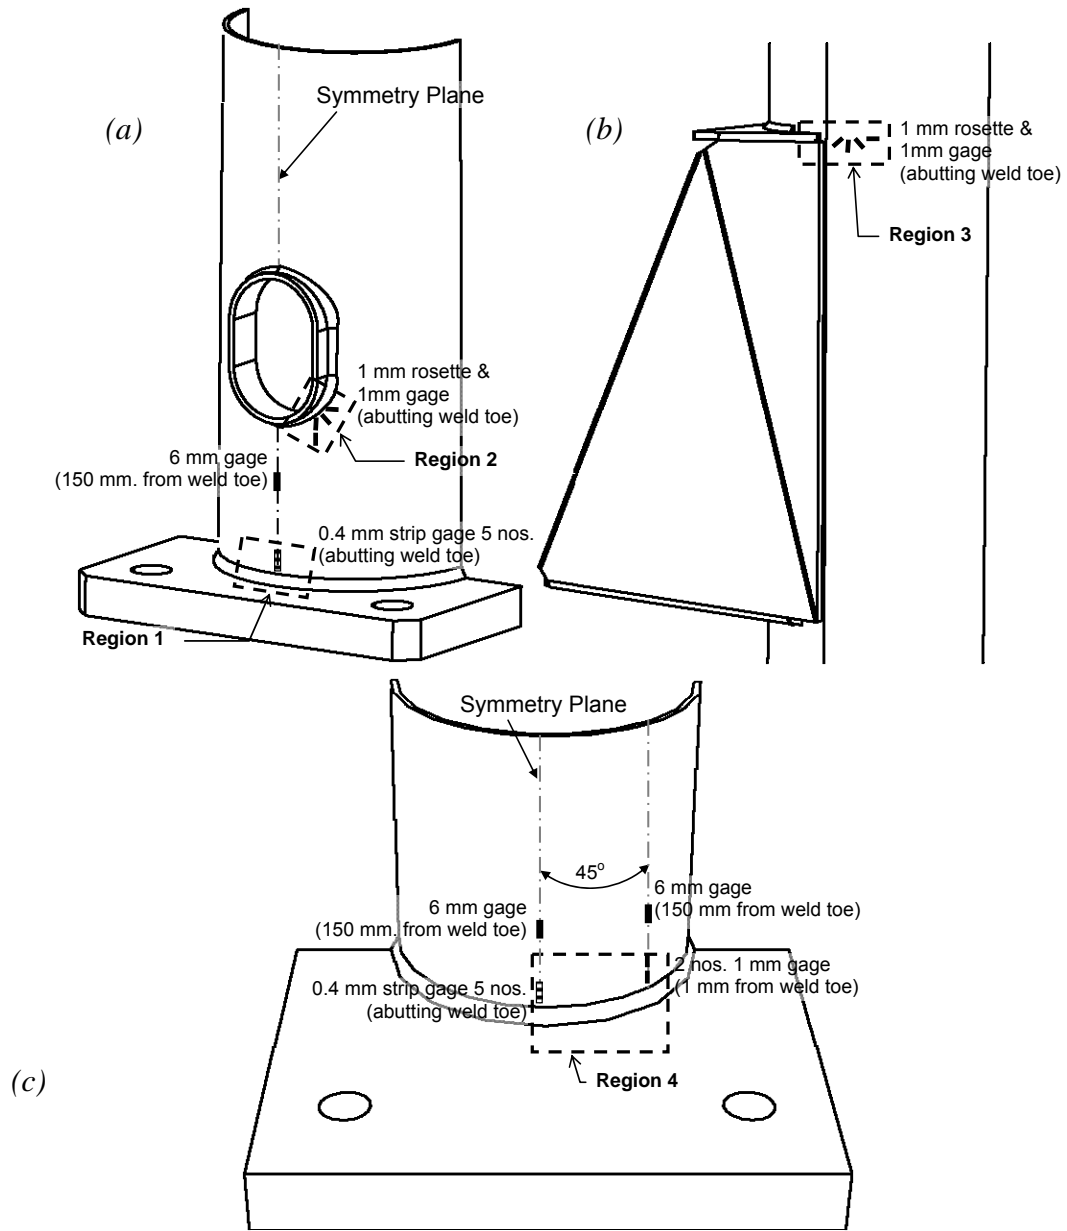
Strain gauge layout in specimen Type II: (a) pole base and hand hole; (b) side gusset top; (c) arm base
